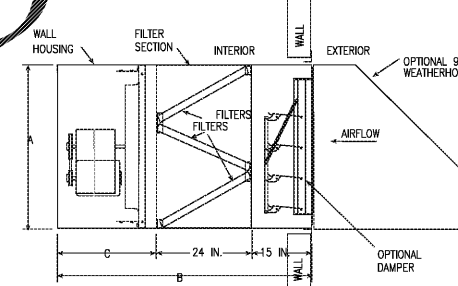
FILTERED SUPPLY WALL HOUSING INSTALLATION
